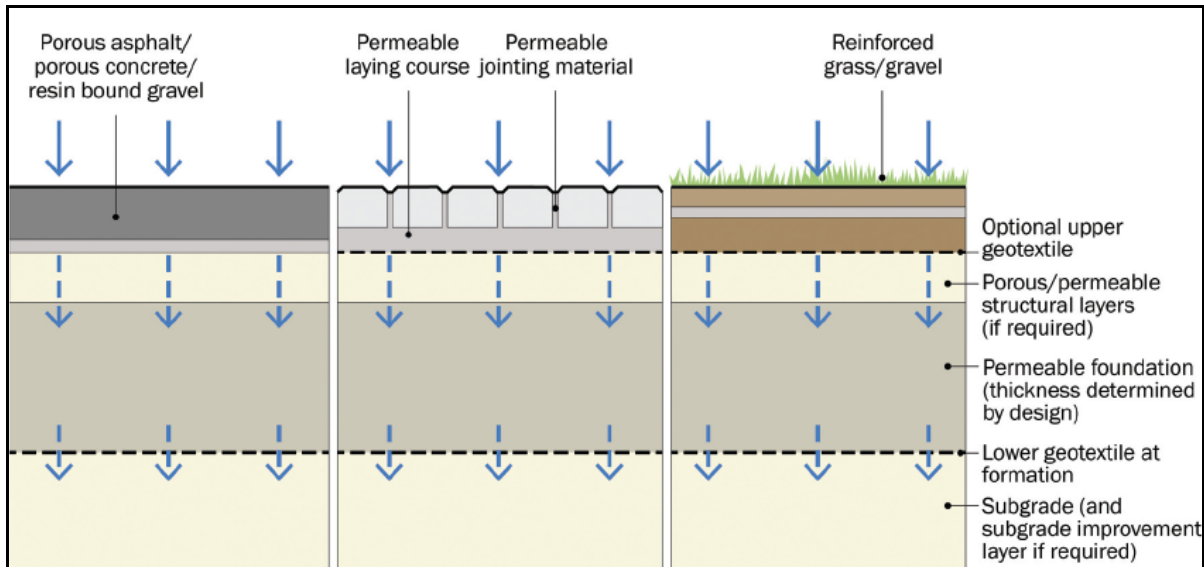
Pervious pavement systems for infiltration (Source: Figure 20.12 of CIRIA 753)
